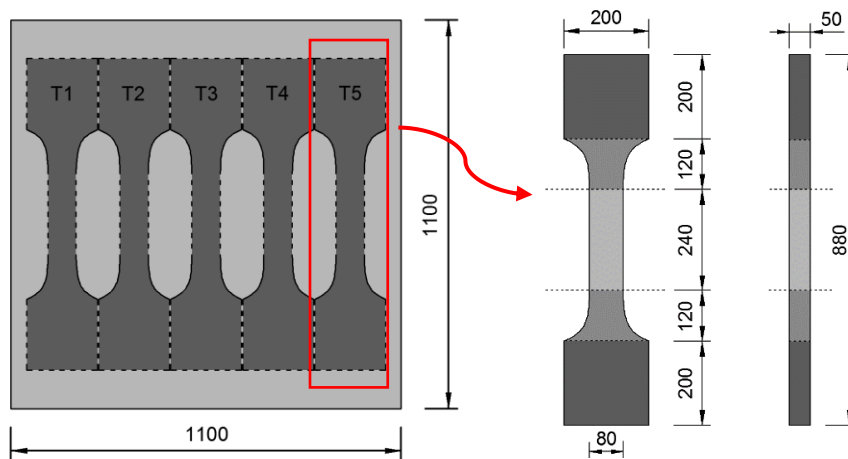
Extracting of dumbbell specimens & Dimension of dumbbell specimen (unit: mm)
